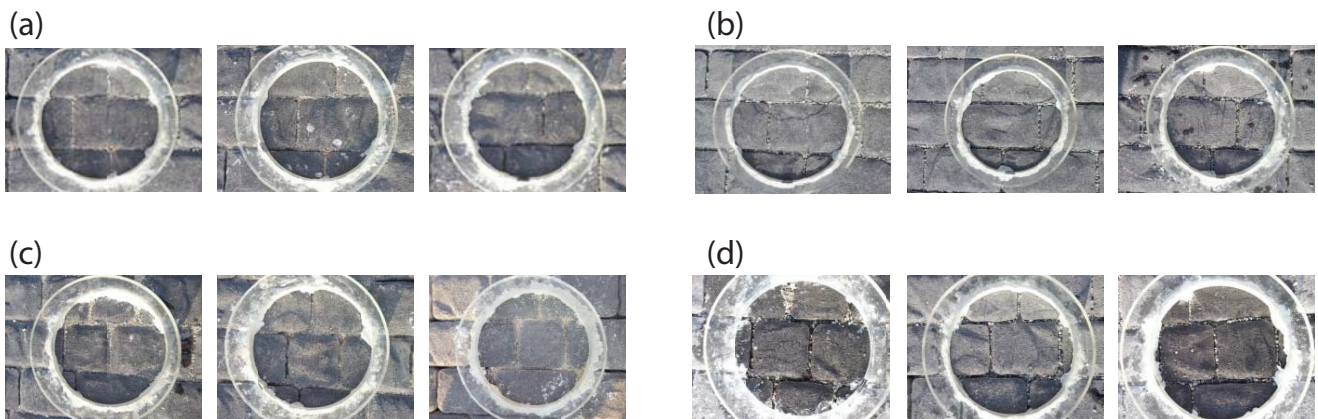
Block patterns contained in infiltrrometer for test V: (a) four crossing joints on BF, (b) four crossing joints on BC, (c) eight crossing joints on BF, and (d) eight crossing joints on BC.
